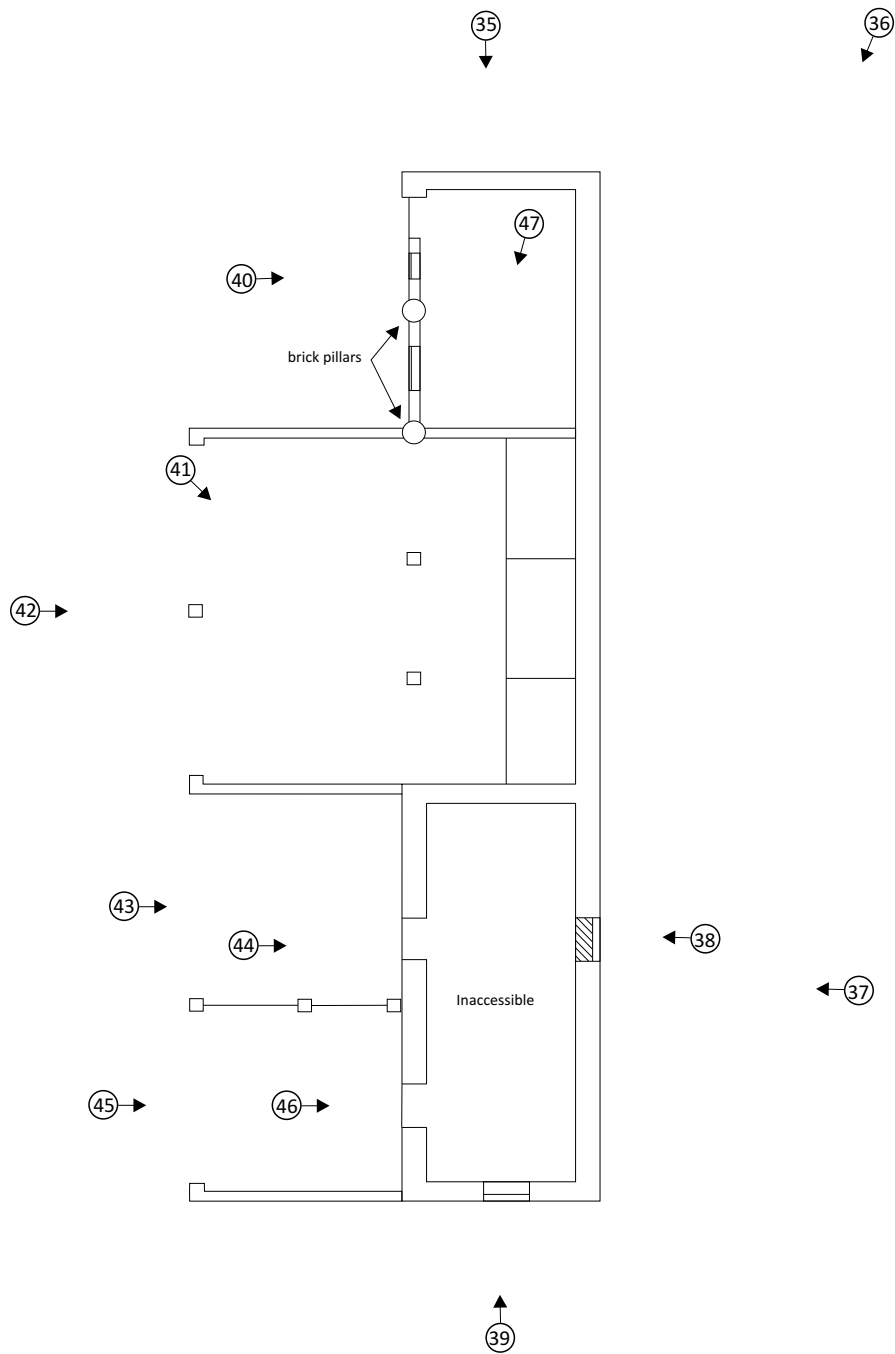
Ground floor and first floor plan of Building A showing direction and location of photographs
